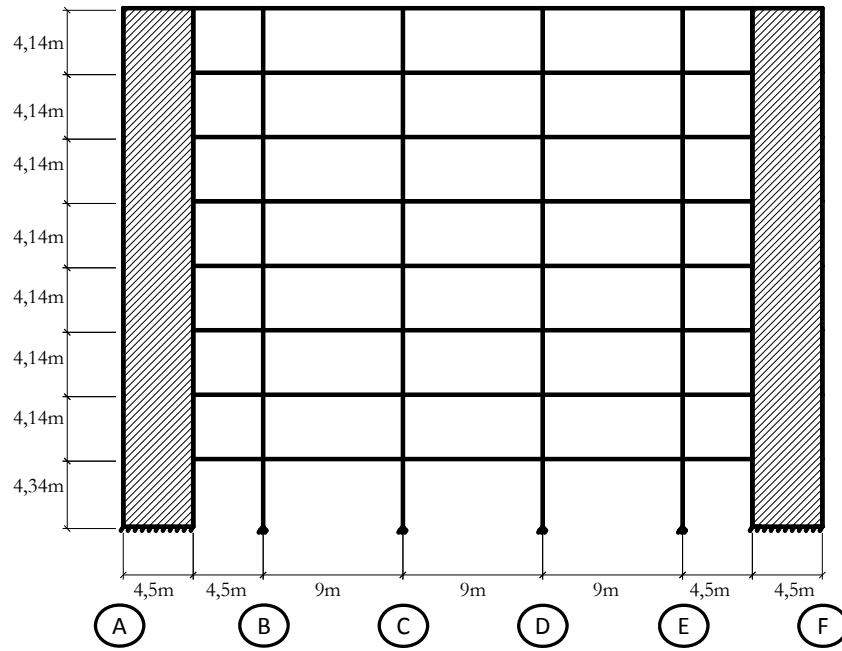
Geometry of sub-structure II, Office building alignment 3
